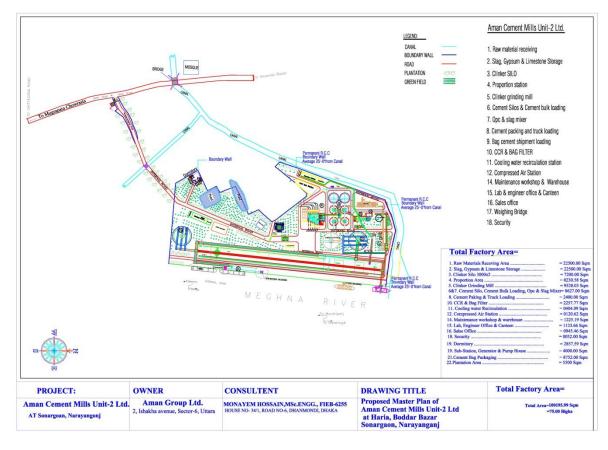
Details Master Plan Layout of Aman Cement Mills Unit-2 Ltd.
